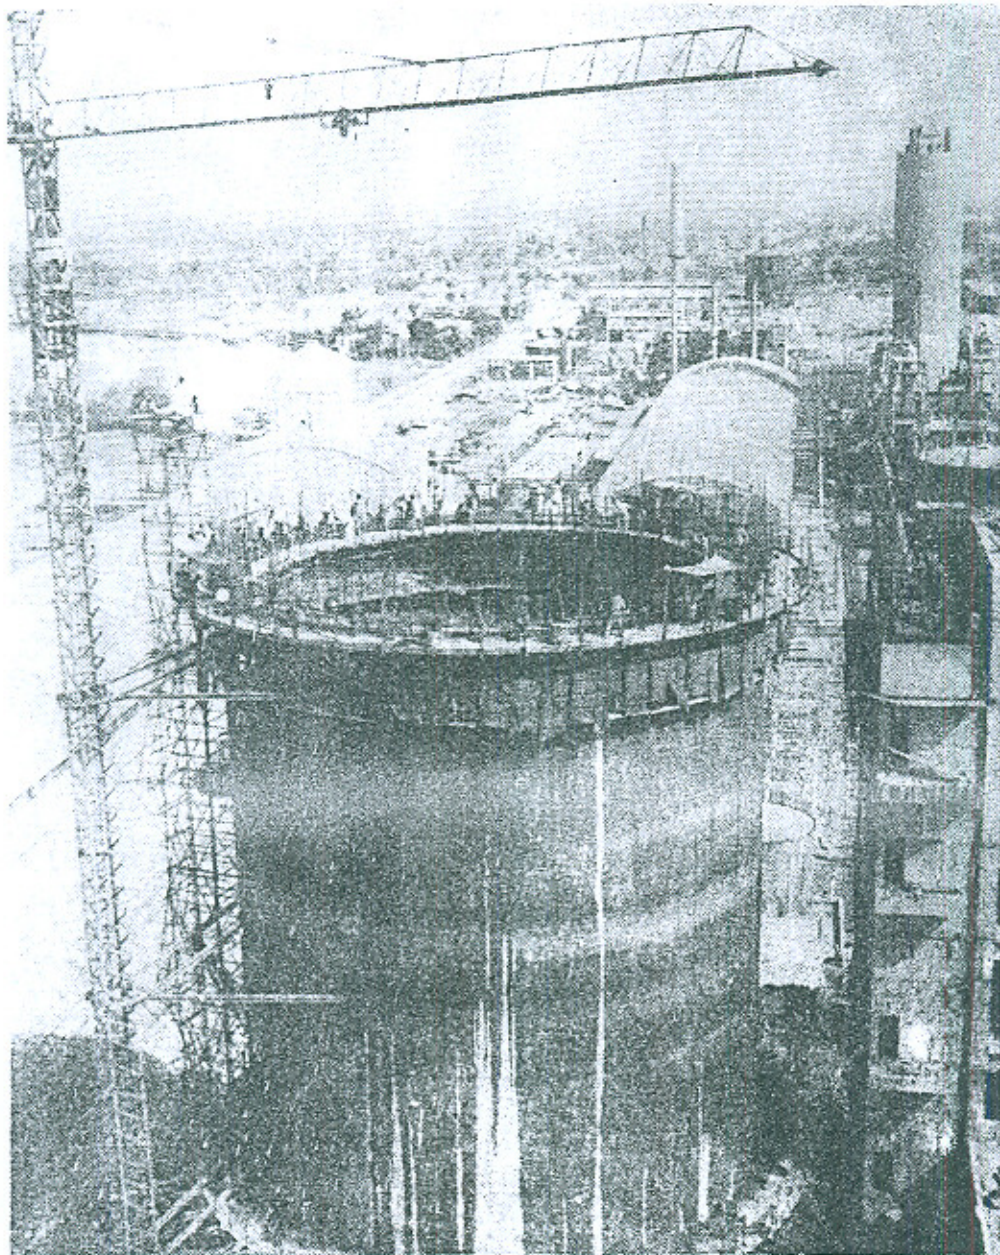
CAN Prilling Tower as on 15th June, 1977 Elevation+119.75 M
